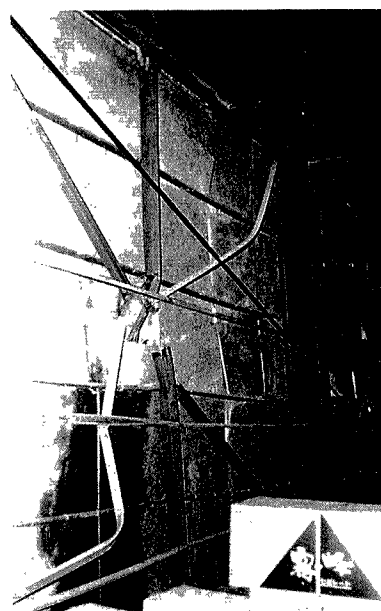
Failure of braces: Sendai Un-yu Soko.
